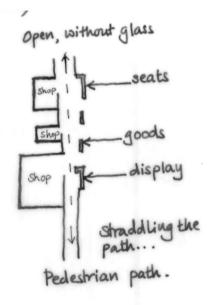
Opening to the street- plan form (Source: Alexander C. 1977: 766)
